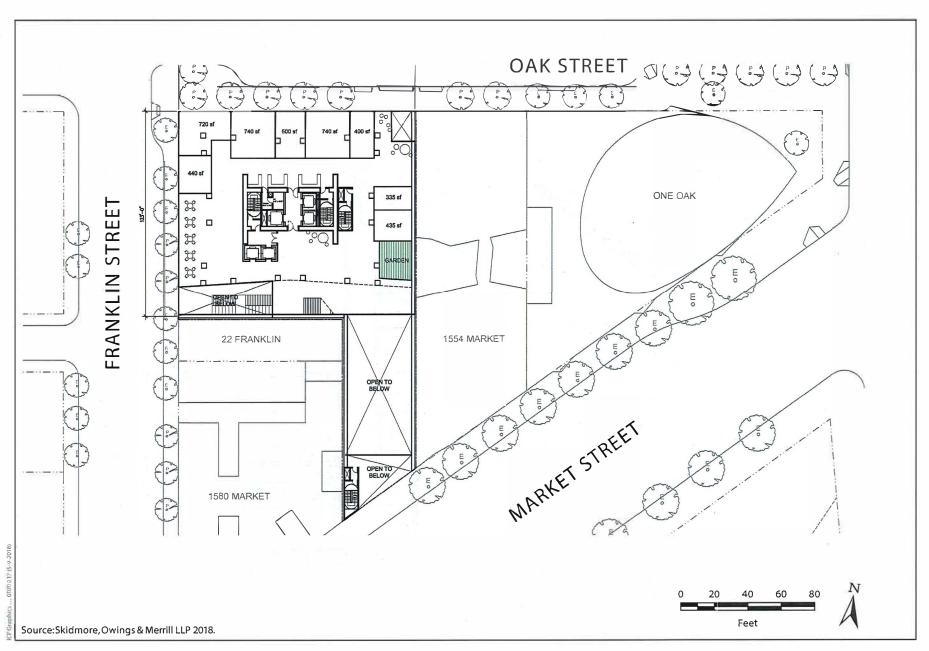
98 Franklin Street Project – Proposed 2nd Level Floor Plan
